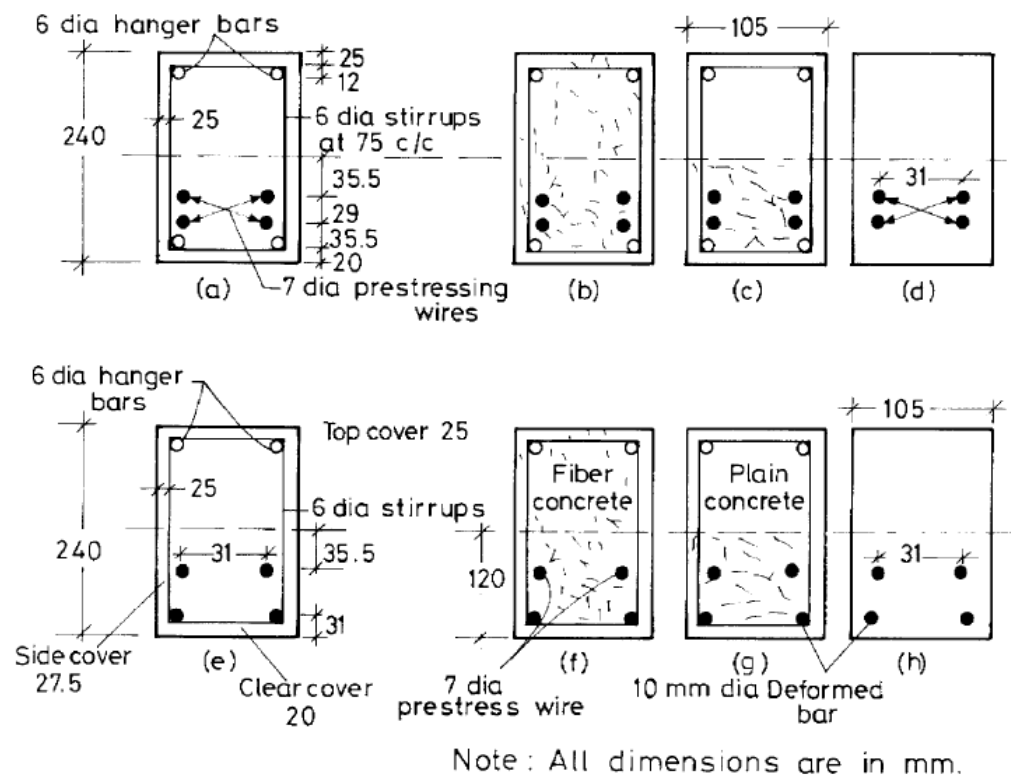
Cross sectional details of specimens (a) fully pre-stressed plain concrete (b) full depth fiber-reinforced pre-stressed concrete (c) fully pre-stressed beam specimens with half depth fiber (d) having partial depth fiber in shear span only (e) partially pre-stressed plain concrete specimen (f) full depth fiber-reinforced concrete partially pre-stressed beam specimen (g) half depth fiber-reinforced partially pre-stressed beam specimen (h) partially pre-stressed beam specimen having partial depth fiber in shear span only (Padmarajaiah & Ramaswamy, 2004)
